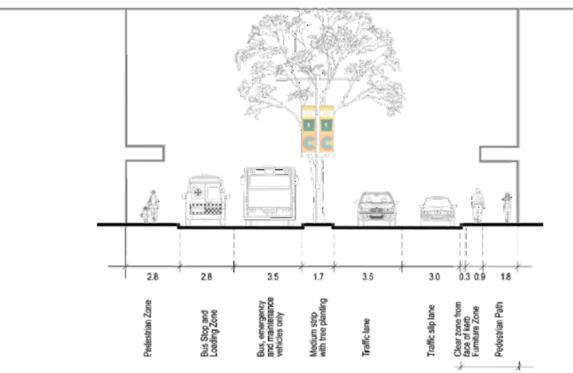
Dunmore Street Section near Garfield Street - Looking West
